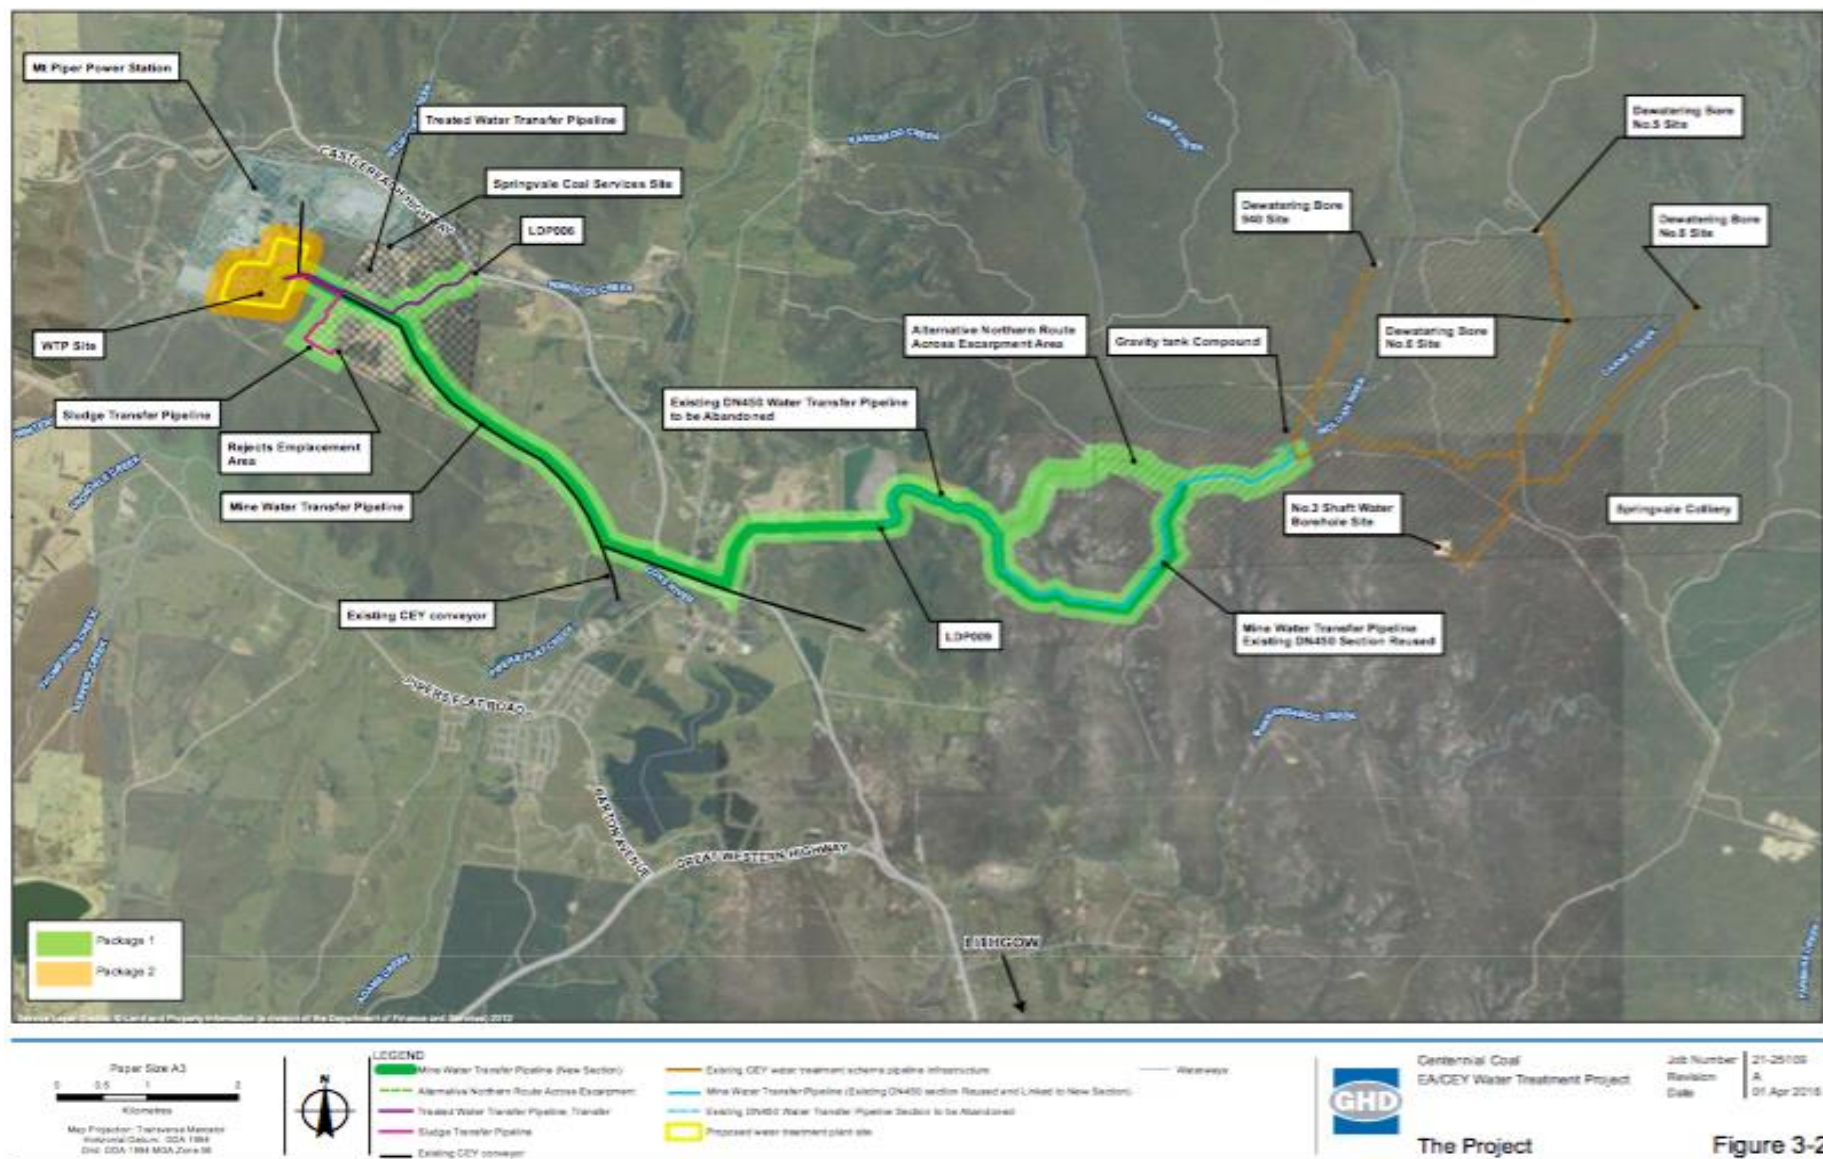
An overview of the proposed piping layout to divert wastewater from the Newnes Plateau to the MPPS [3]
